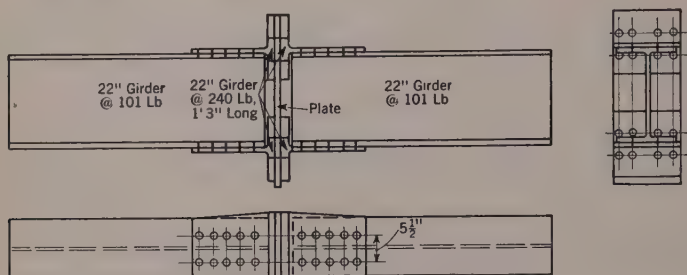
TYPICAL COLUMN AND GIRDER JOINT
